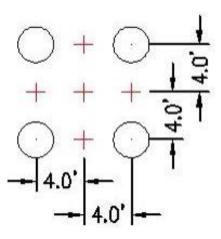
Typical plan detail for the stone column and wick drain treatment at the Silver Reef Casino case history.
